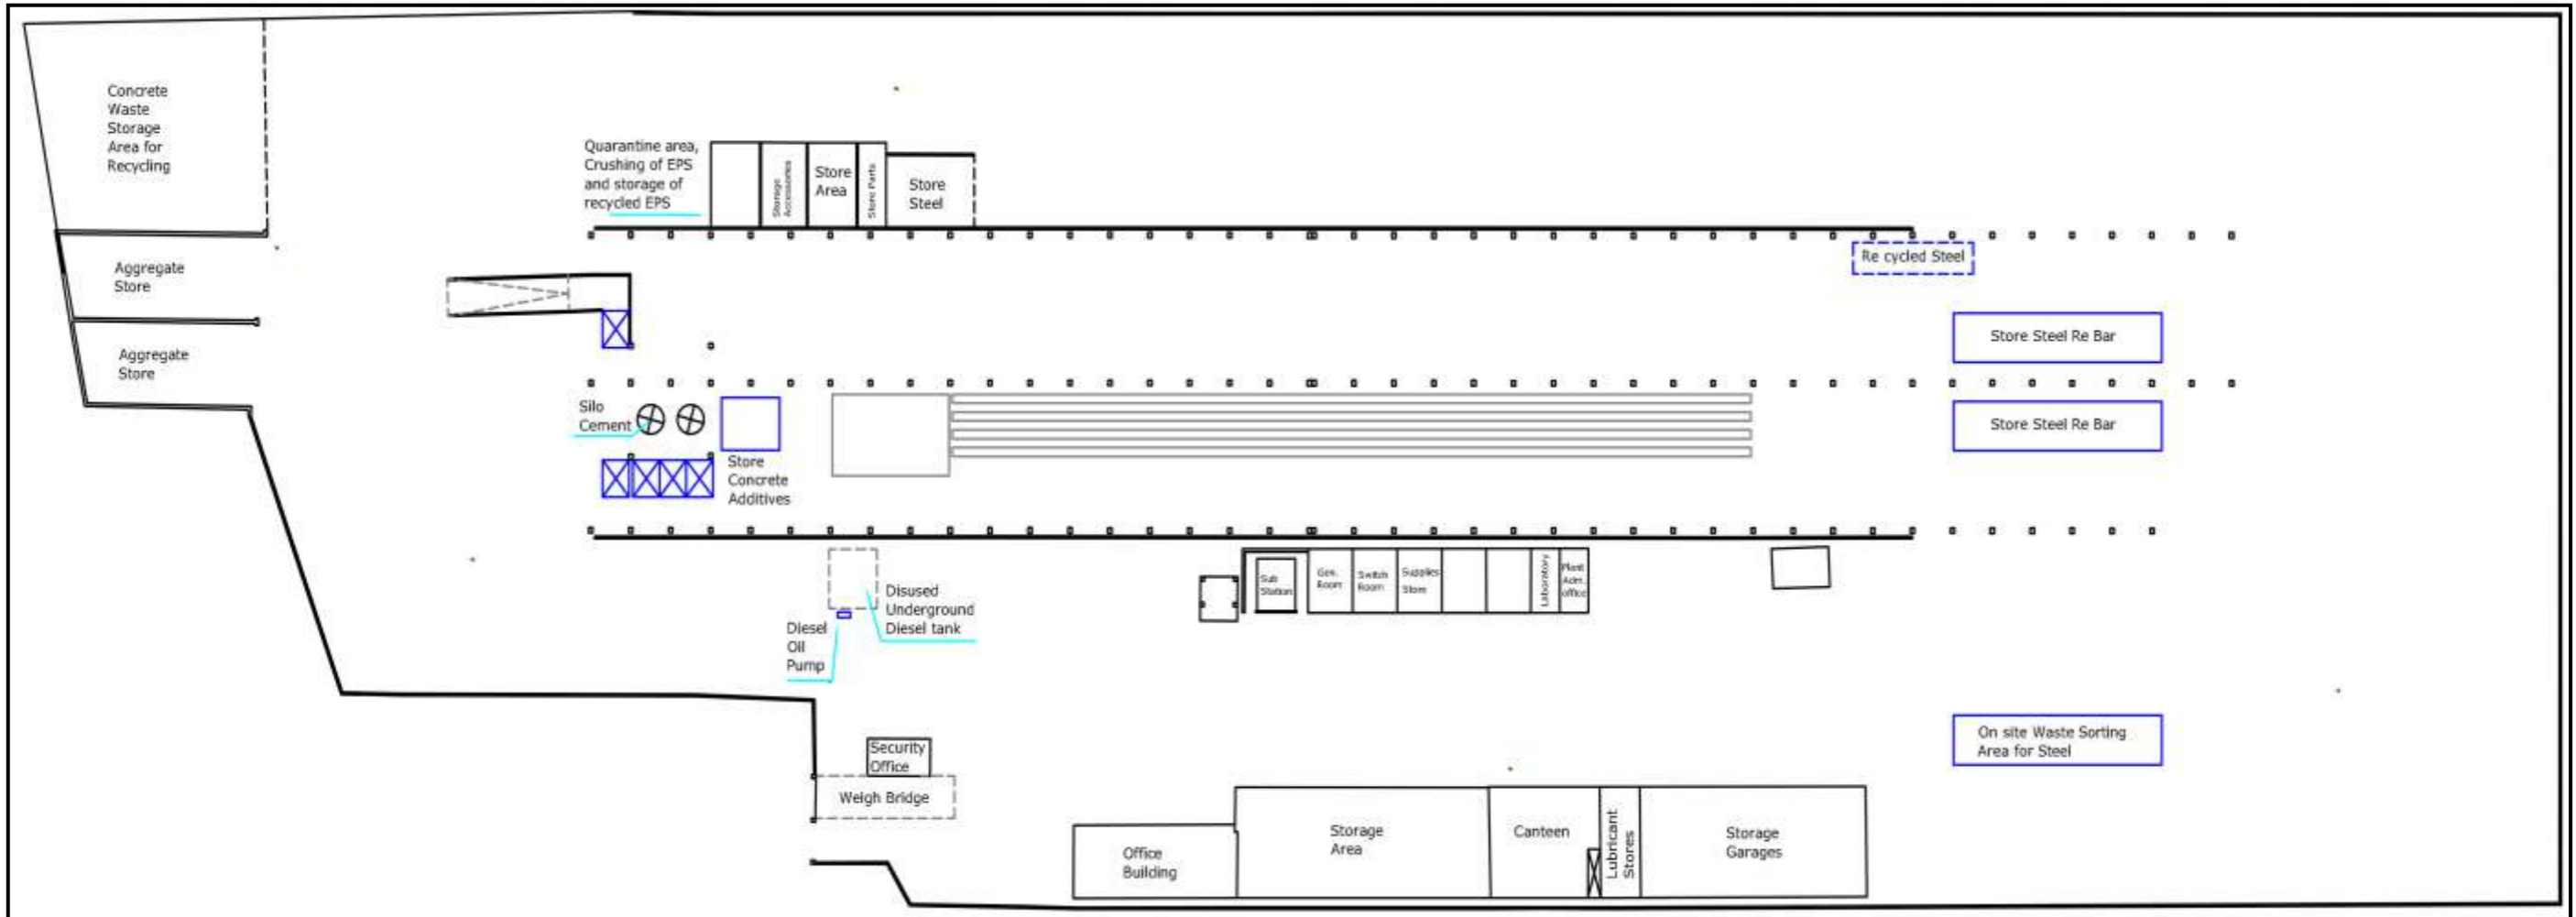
B: Site of installation, showing detailed operational infrastructure for the carrying out of the activities specified in condition 1.1.1. The extent of the site boundary is indicative and shall not be used for interpretation purposes.
